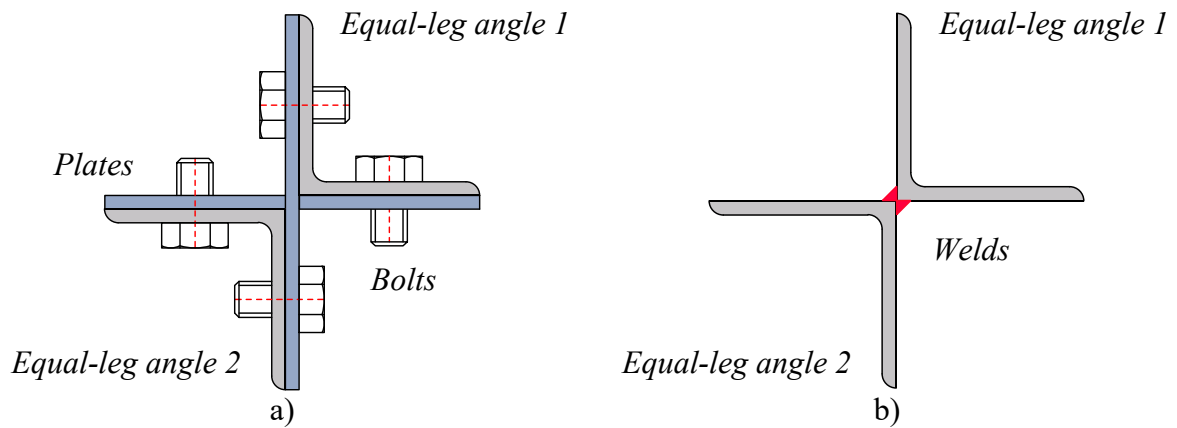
Dual equal-leg angle starred built-up section with a) bolted plate and b) welds.
